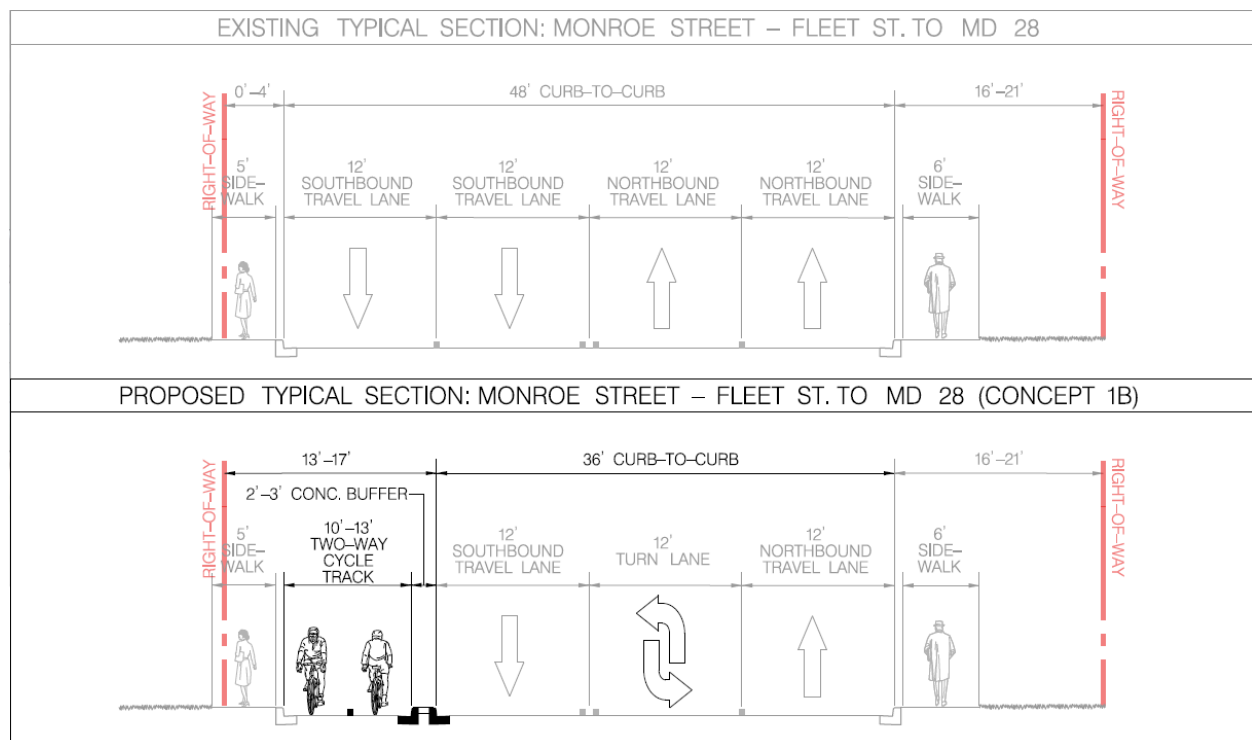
Existing and proposed typical section for on-street two-way cycle track option.
